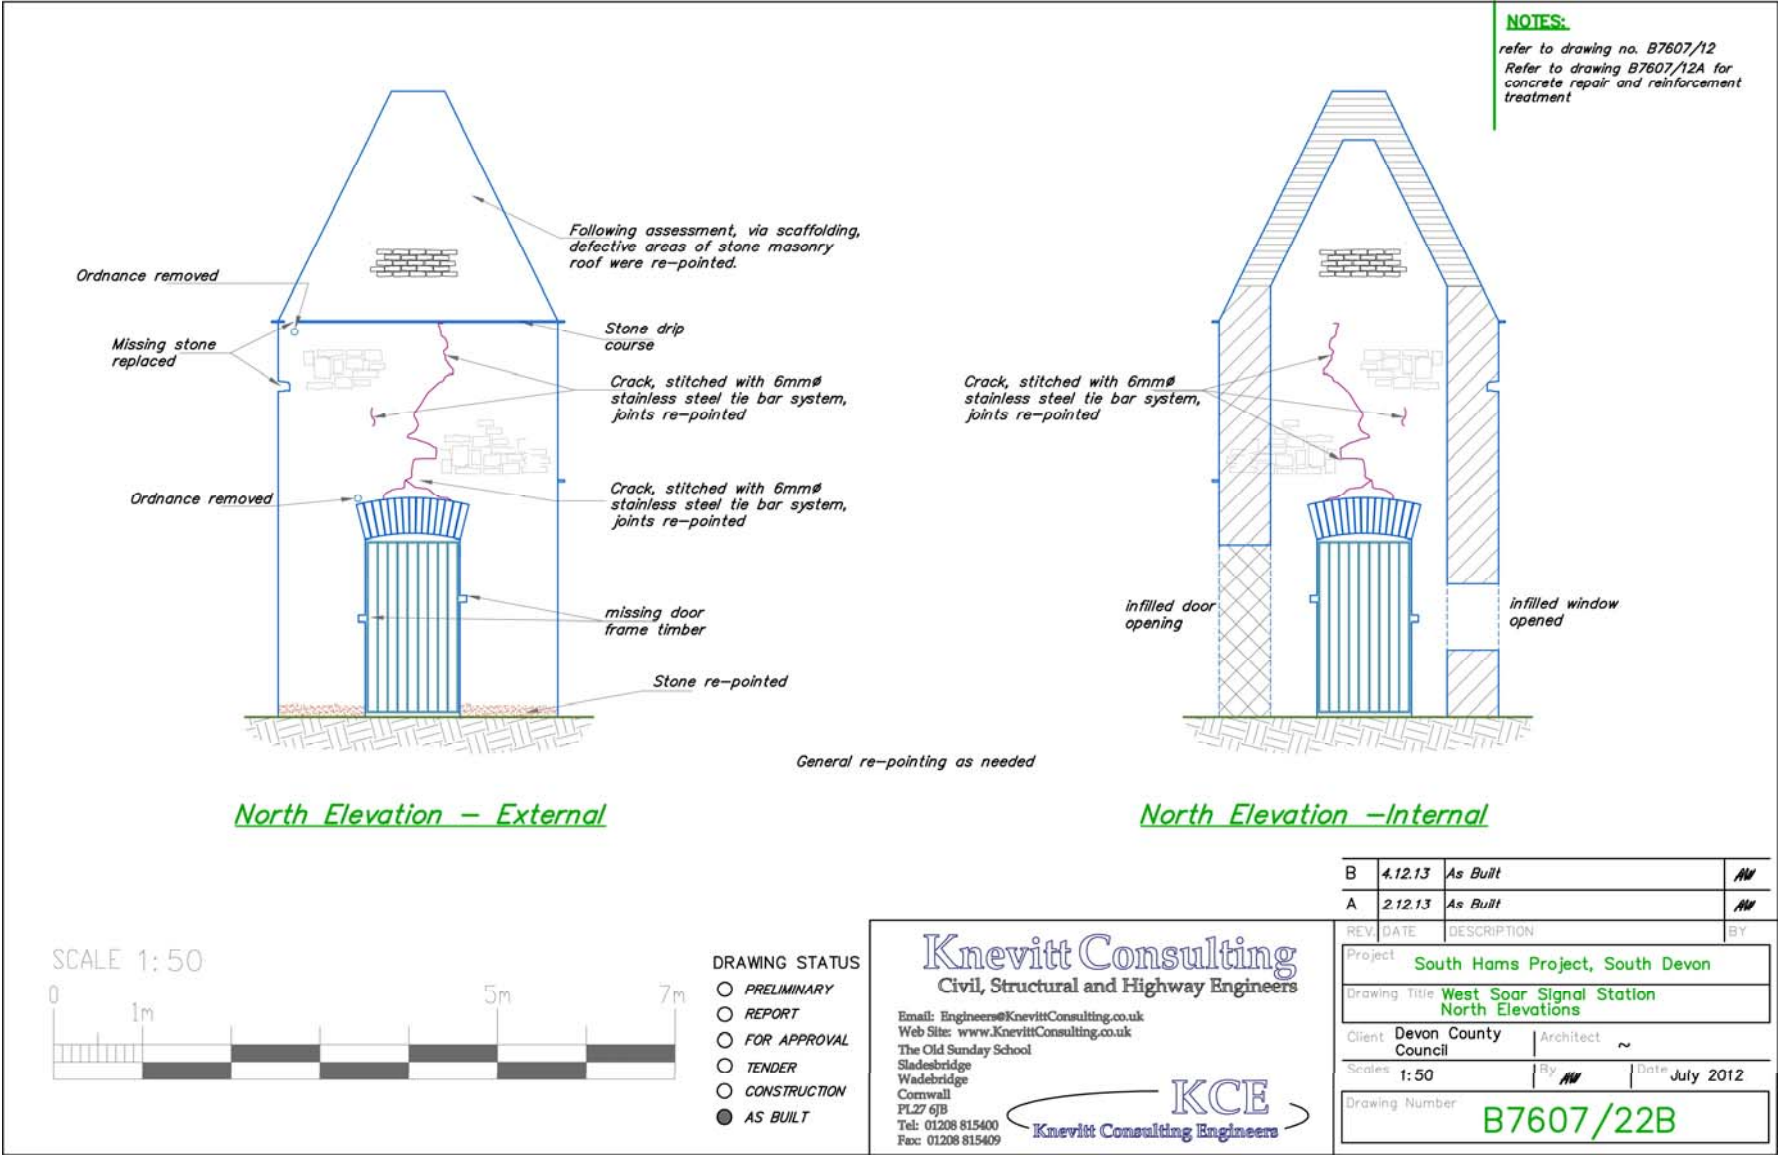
North elevations of the West Soar Signal Station after works © Kneivitts 4/12/13.
